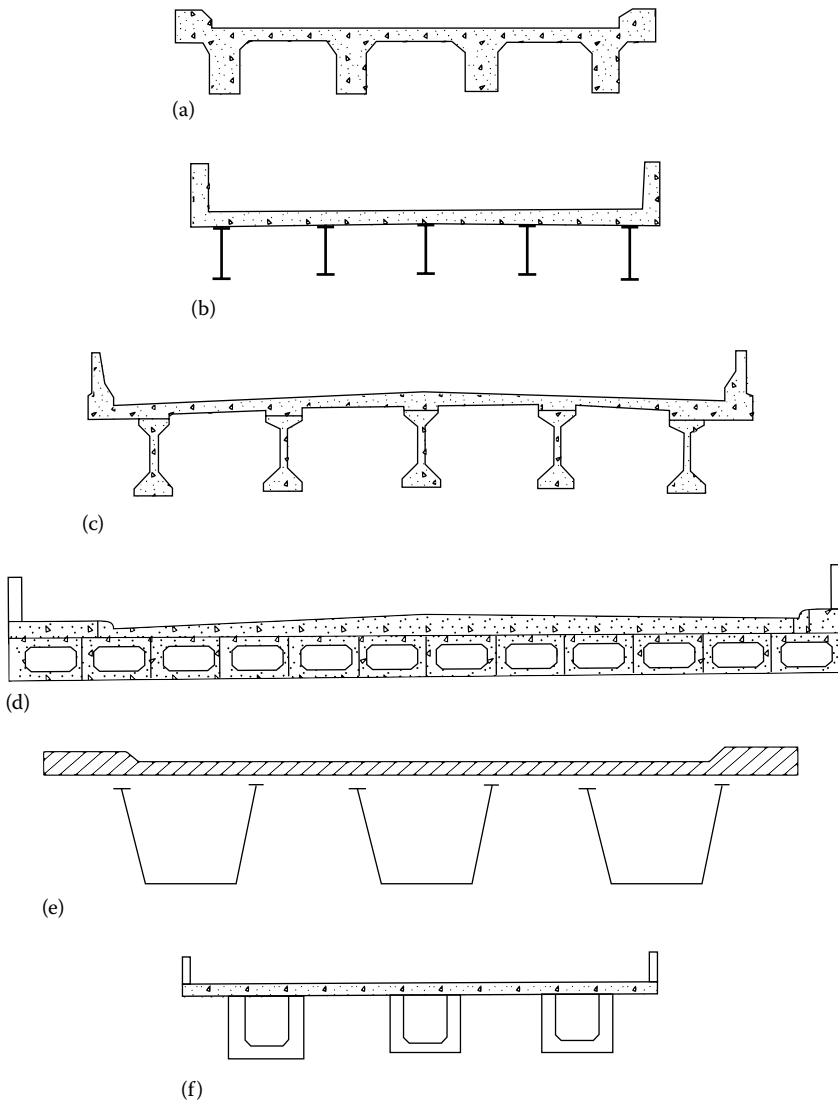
Concrete deck systems: (a) T-beam bridge, (b) slab on steel beams, (c) slab on prestressed concrete I-beams, (d) contiguous prestressed box beam and slab deck, (e) multispine deck with steel box beams, and (f) multispine deck with concrete U-beams. All decks shown have one characteristic in common—the primary or main reinforcement is oriented *perpendicular* to traffic.
